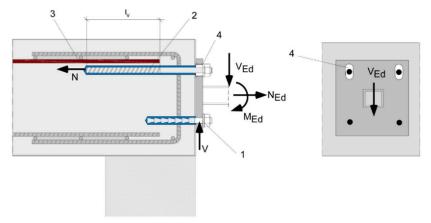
Lap to a foundation of a column under bending. 1. Shear lug (or fastener loaded in shear) 2. fischer rebar anchor FRA (tension only) 3. Existing stirrup / reinforcement for overlap (lap splice) 4. Slotted hole
